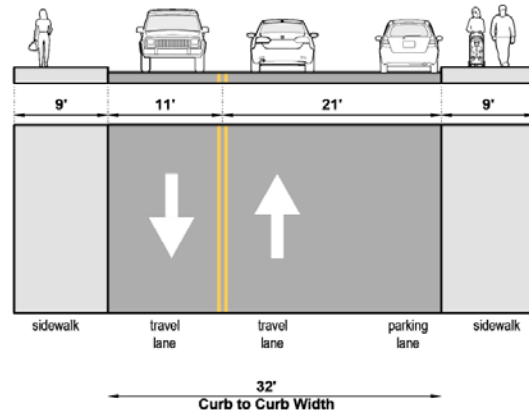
Existing conditions on 9th Street between Jackson Street and Wacouta Street.
